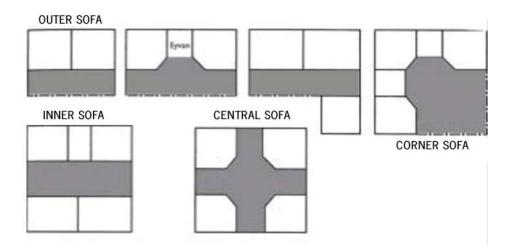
Floor plans of traditional Turkish homes with typical sofa room arrangements. For example a "central sofa" is a room where sofa beds are arranged in each corner of the the space leaving a space in the center.
